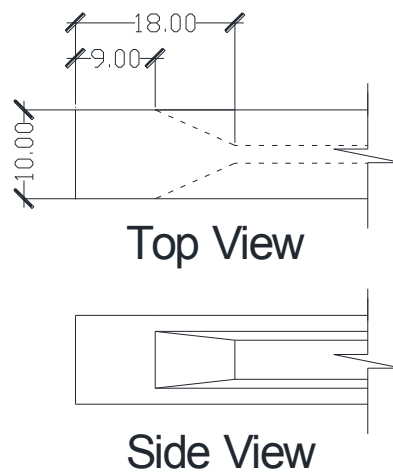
Change in Cross-Section of the Top 18 inches on the UHPC Test Unit (all dimensions in inches)
